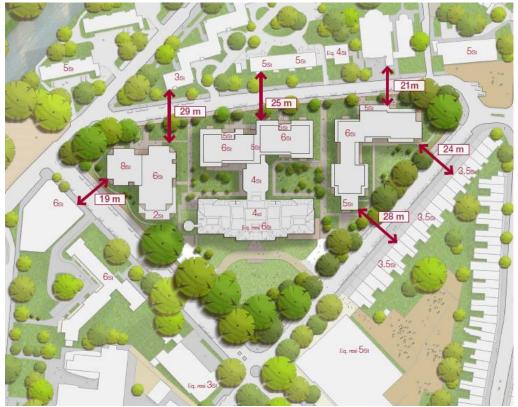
Proposed Building Heights (no. of storeys) and proximity to neighbouring sites
